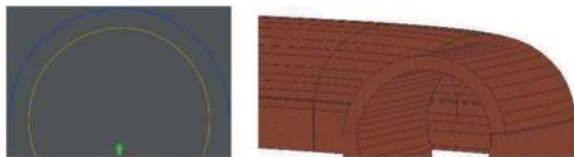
As built tunnel section (left) and as built tunnel BIM model (right).
